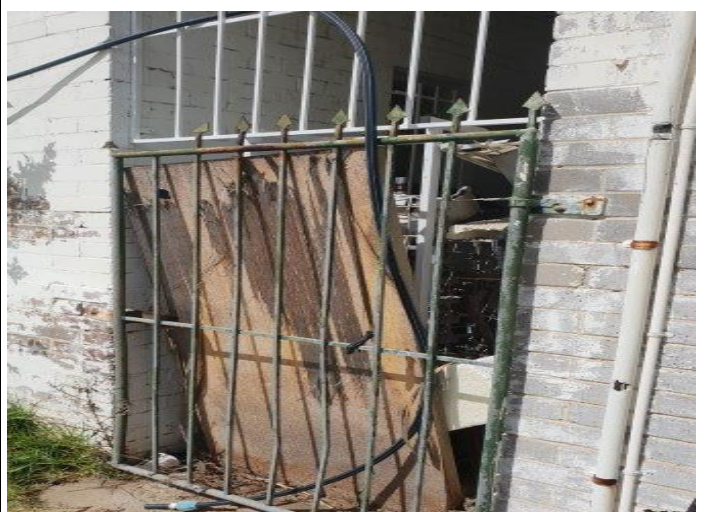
32-34 Good Street, western elevation, gate, lead containing white paint (WSP-104453).
